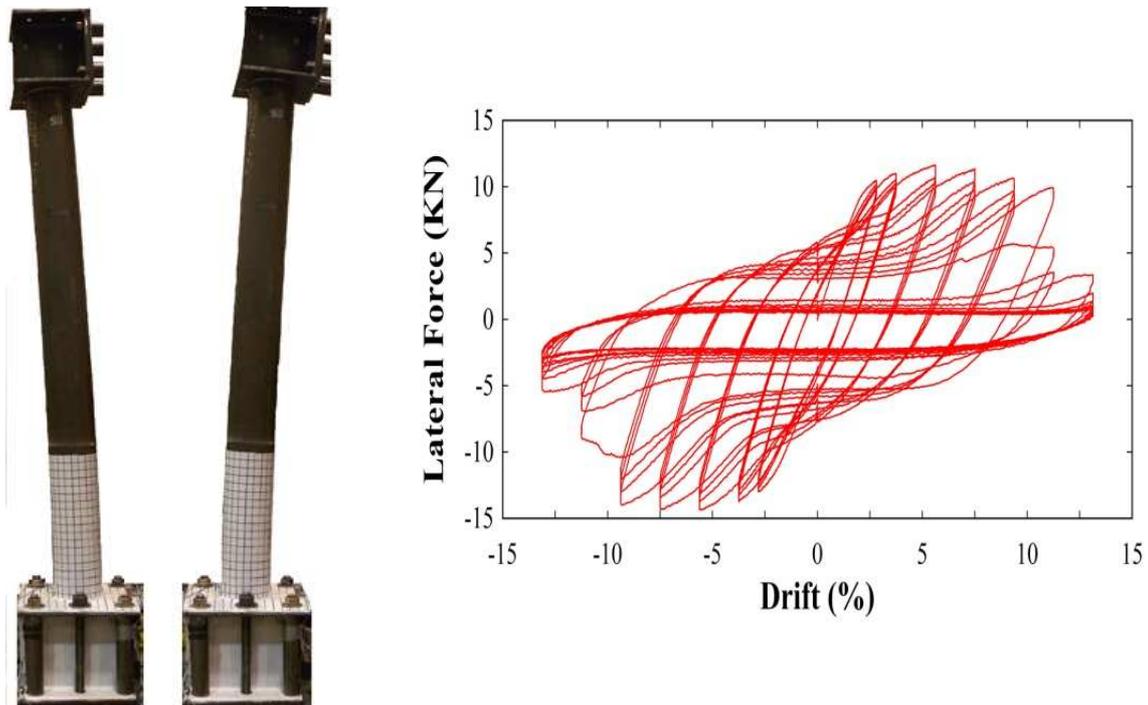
Specimen at Maximum Strength (Left) and Typical Hysteretic Loop (Right)
